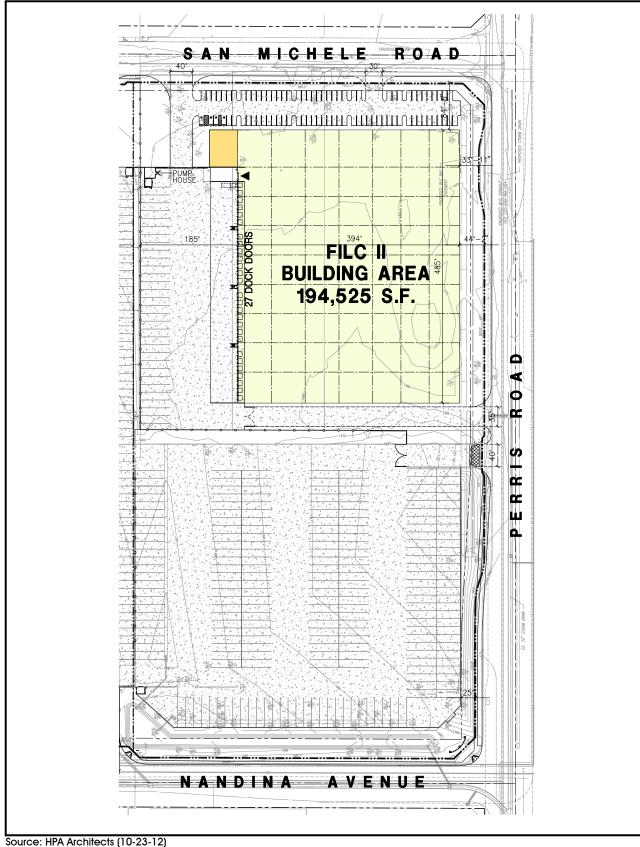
Reduced Project/North Building Alternative Roadway improvements and access points would be identical to the proposed Project under this alternative, except that an additional access would be provided to Perris Boulevard on the north side of the existing truck trailer parking area. The existing screen walls would be extended under this alternative and would occur along the entire frontage with Perris Boulevard and San Michele Road, while the screen walls along Nandina Avenue would be demolished and replaced along the northern edge of the employee parking area proposed adjacent to Nandina Avenue.
